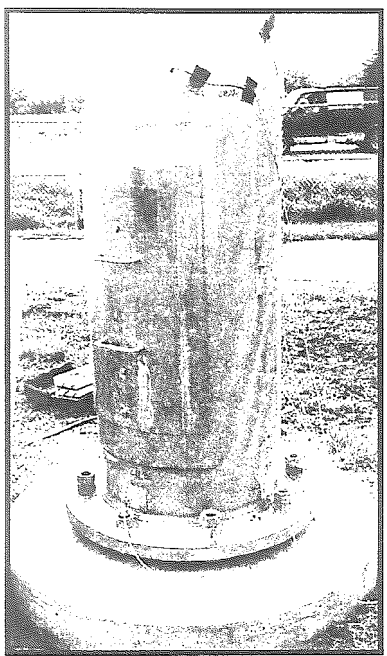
Sioux City, Iowa Retrofit to Stiffen the High-mast Lighting Tower
